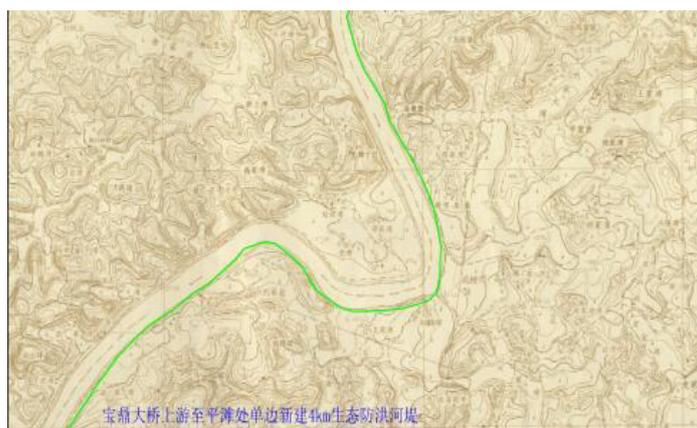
Embankment Line of Gao'an Town (from upstream of Baoding Bridge to Pingtan)
